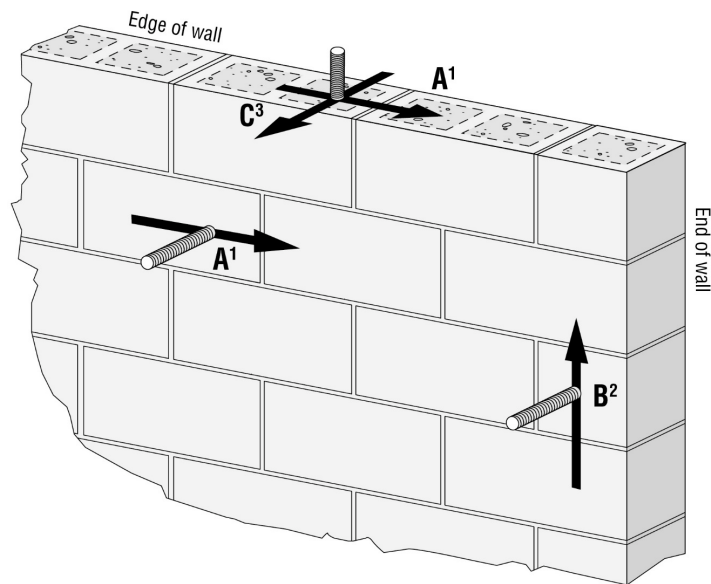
ALLOWABLE ANCHOR LOCATIONS FOR FULL AND REDUCED LOAD CAPACITY WHEN INSTALLATION IS IN THE FACE OF HOLLOW CMU MASONRY WALL CONSTRUCTION
